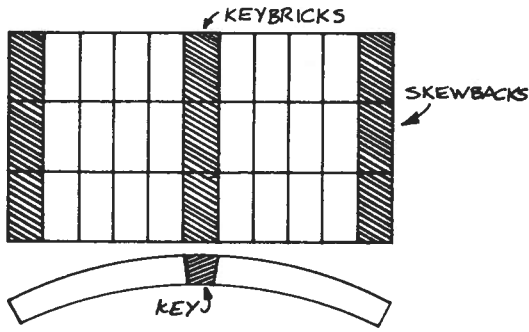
17: Ring arches expand during fire and, if one brick fails, the whole ring fails.
